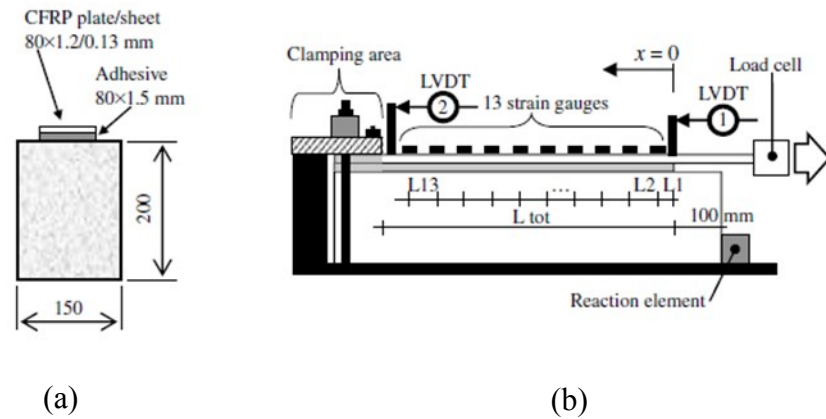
Experimental setup: (a) specimen transverse section; (b) side view with instrument position and clamping system for both concrete specimen and CFRP plate extracted from Mazzotti et al. (2009)
